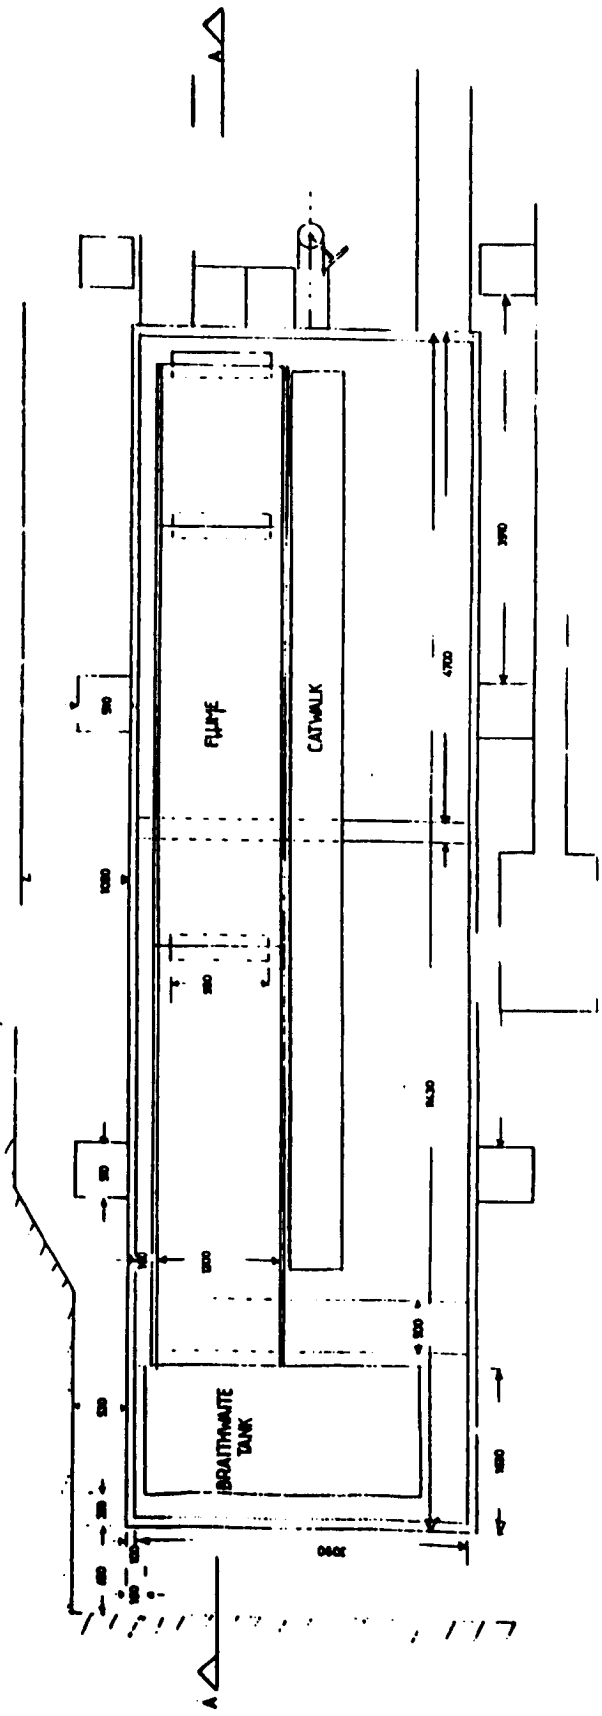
, 3.2 and 3.3 show the overall flume layout, jacking points and stiffener details.
